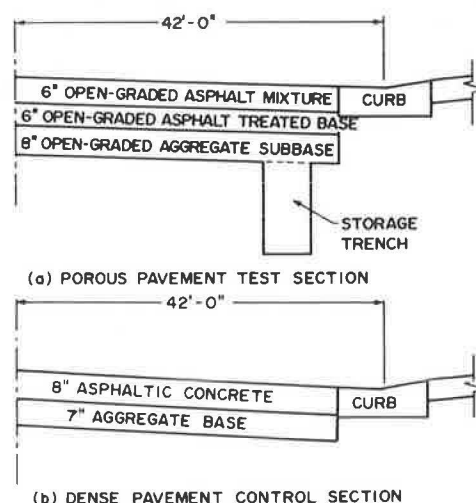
Typical cross section of ADOT's experimental porous pavement.
